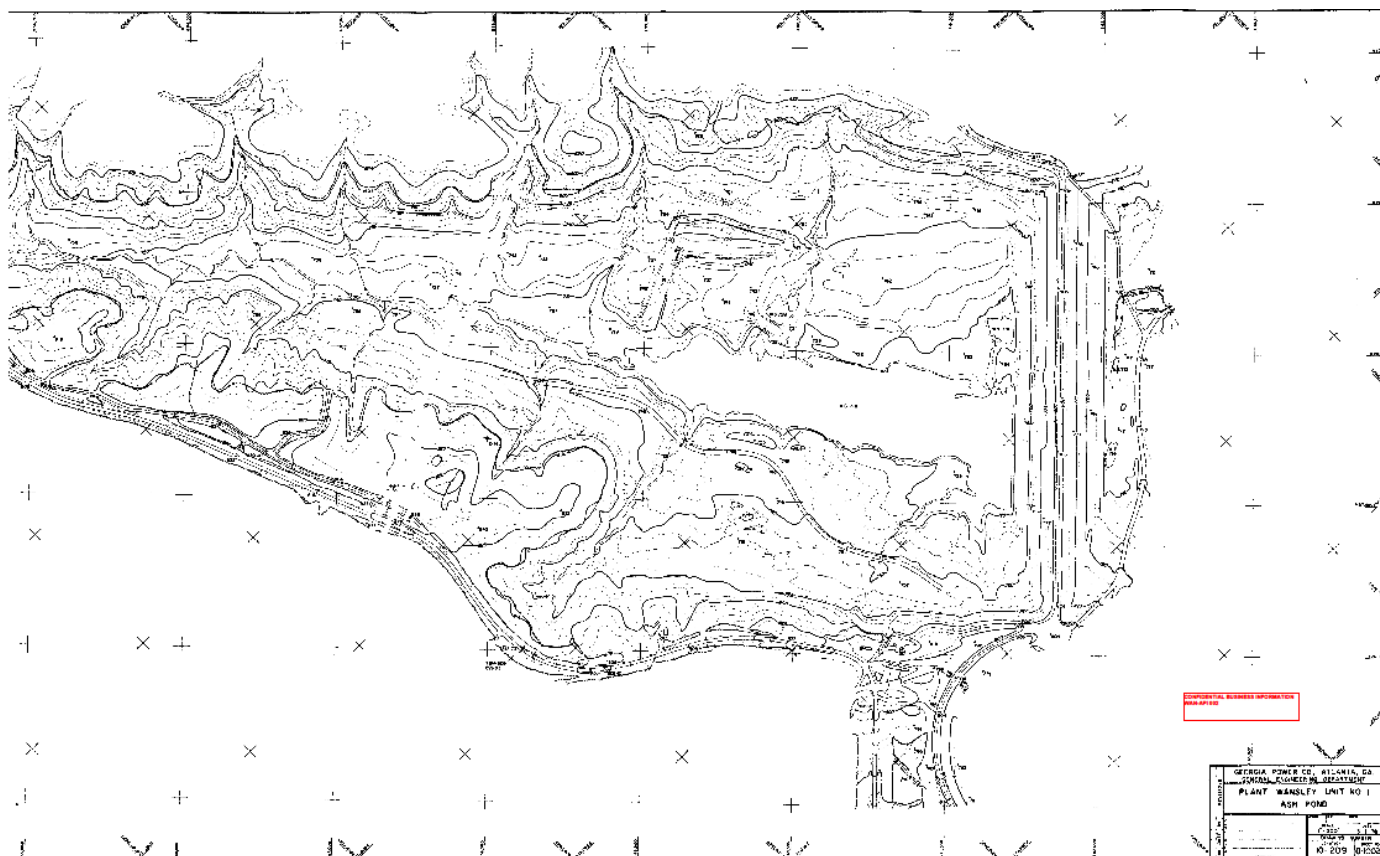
a: Plant Wansley Unit No 1 – Ash Pond
